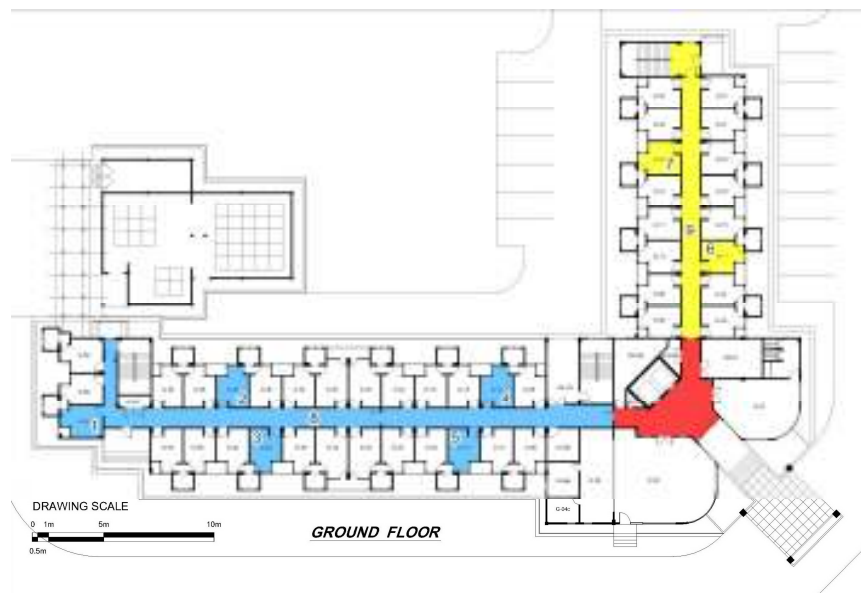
Plan of the hostel. (international house, ground floor). (Source building management office, USM).
